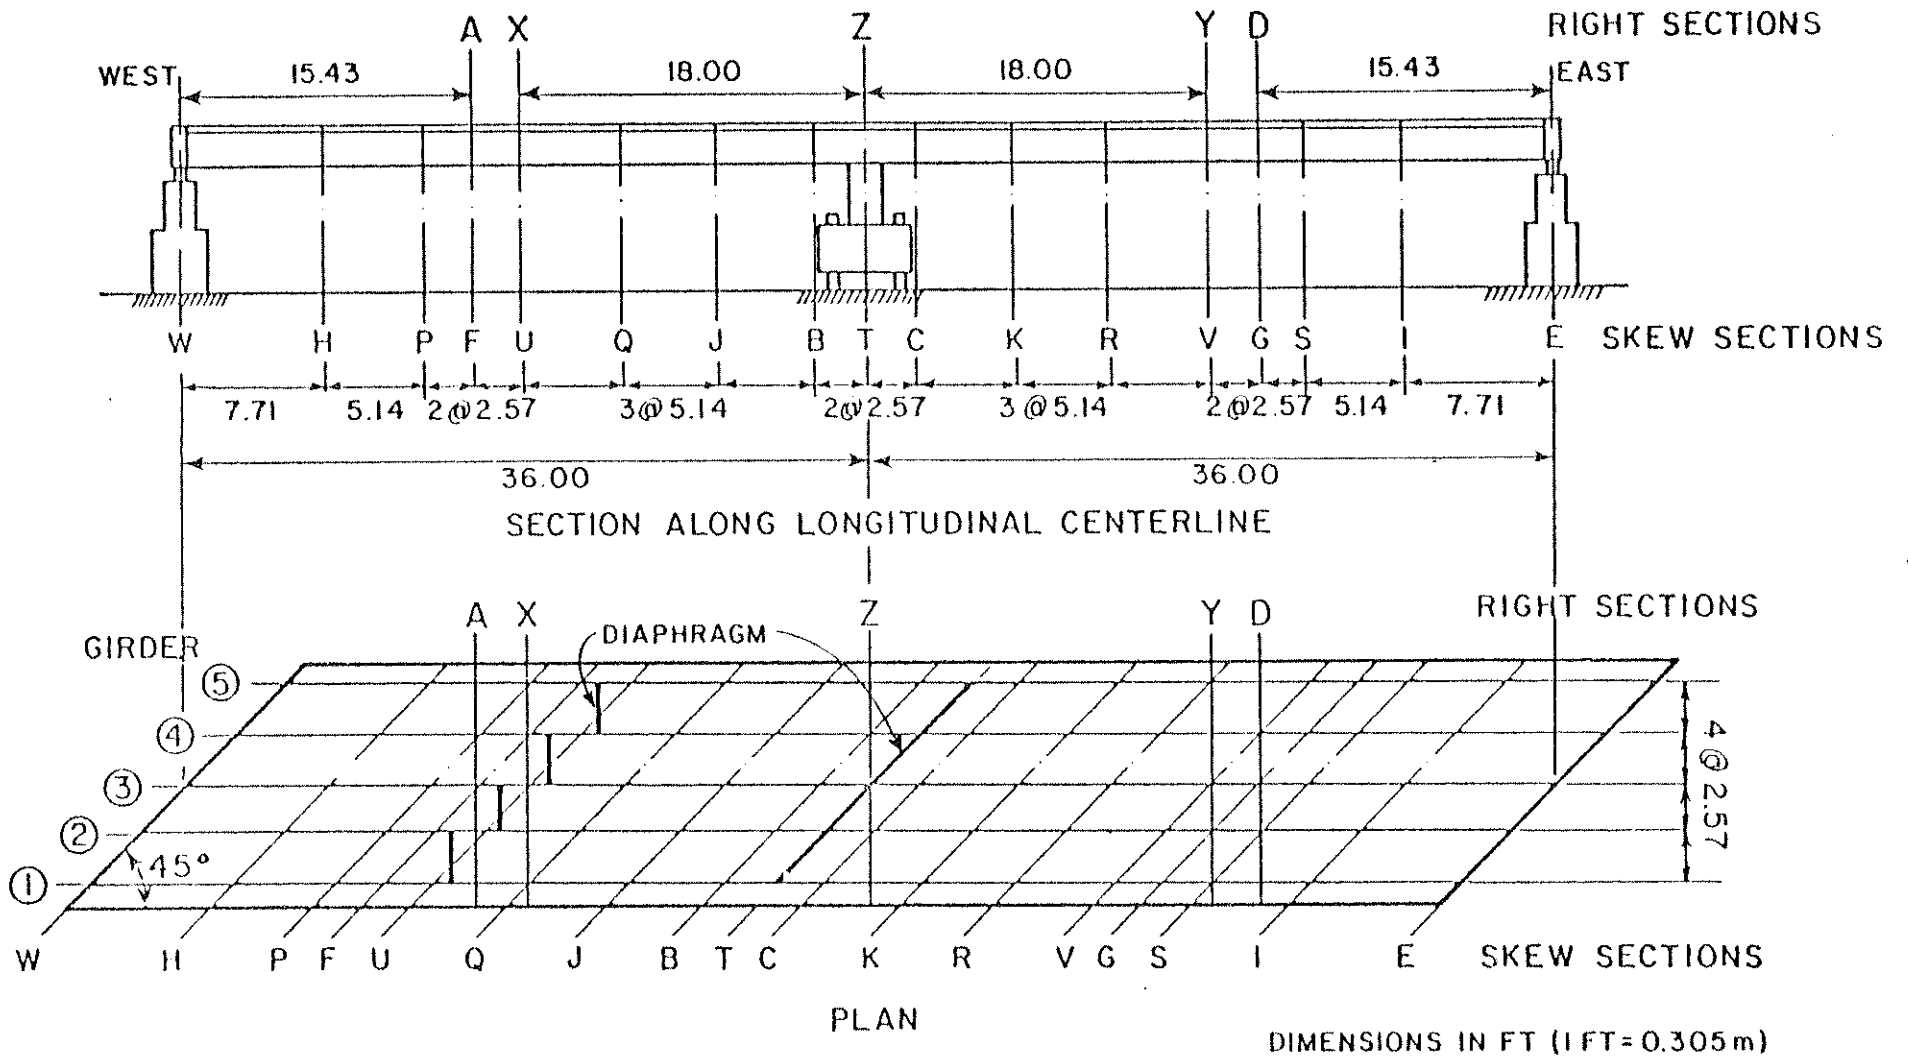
DIMENSIONS OF SKEW BOX GIRDER BRIDGE MODEL WITH LOCATIONS OF TRANSVERSE SECTIONS AND LONGITUDINAL GIRDER LINES
